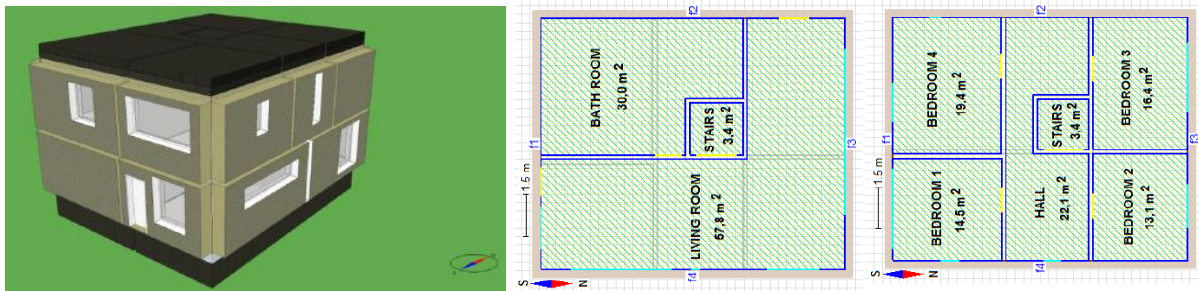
Layout and floor plans of the new detached house for the Finnish case study
